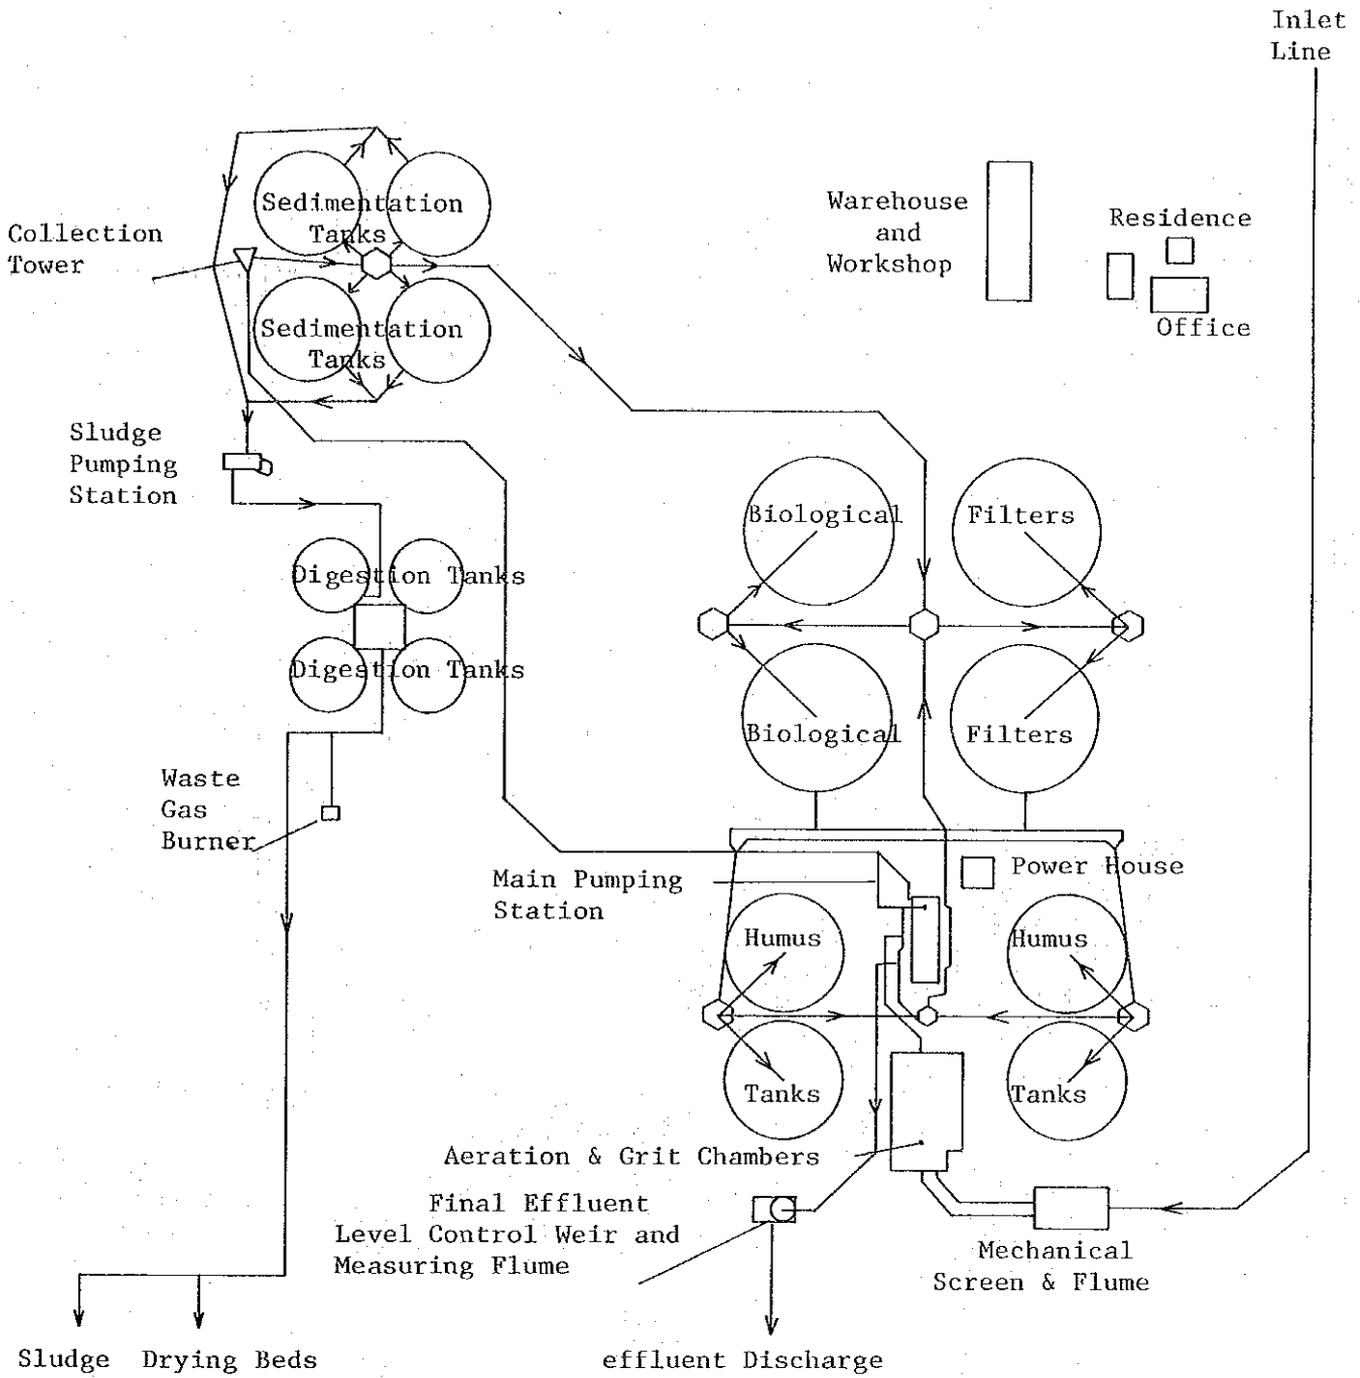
RIYADH SEWAGE TREATMENT PLANT LAYOUT
